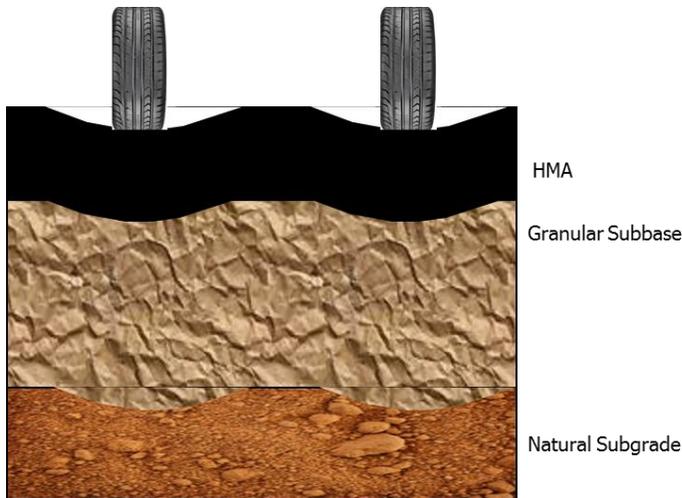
Schematic of Pavement Rutting in a Flexible Pavement Caused by Subgrade Consolidation.¹¹⁴
